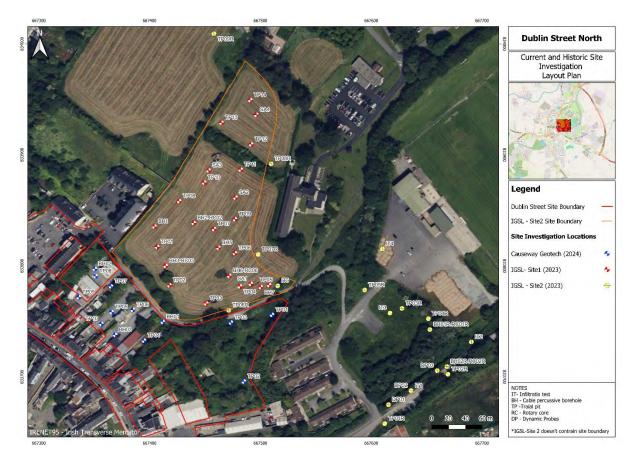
2024 GI and Historic Site Investigation Layout Plan
